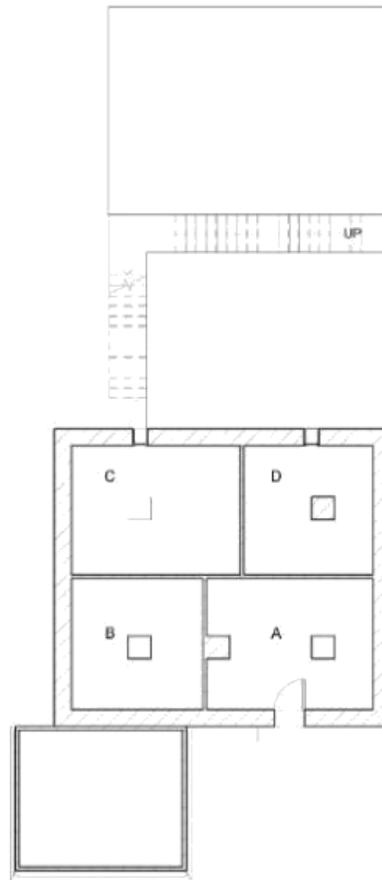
Al-Ghutamiya House First Floor Preliminary Plan (developed by the researcher)
